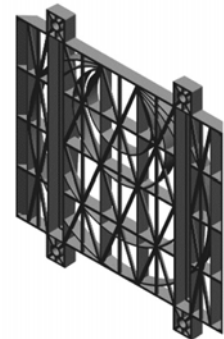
STORMVAULT Perimeter End Plate. To be installed only on the outside face of the perimeter tanks.
